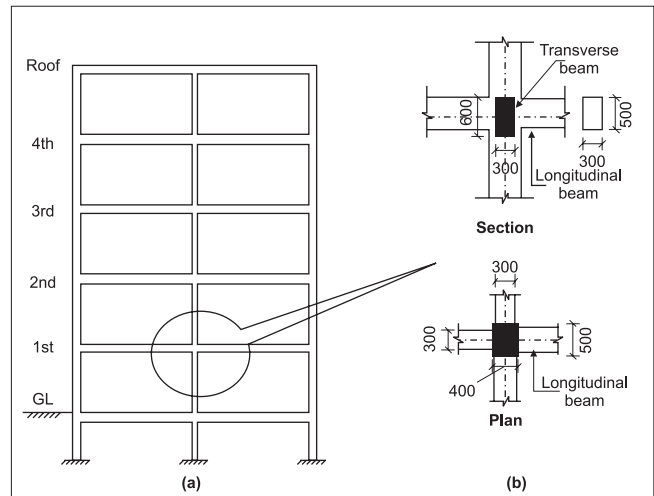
(a) Joint location in elevation of the building, (b) Details of the connected members in the joint
